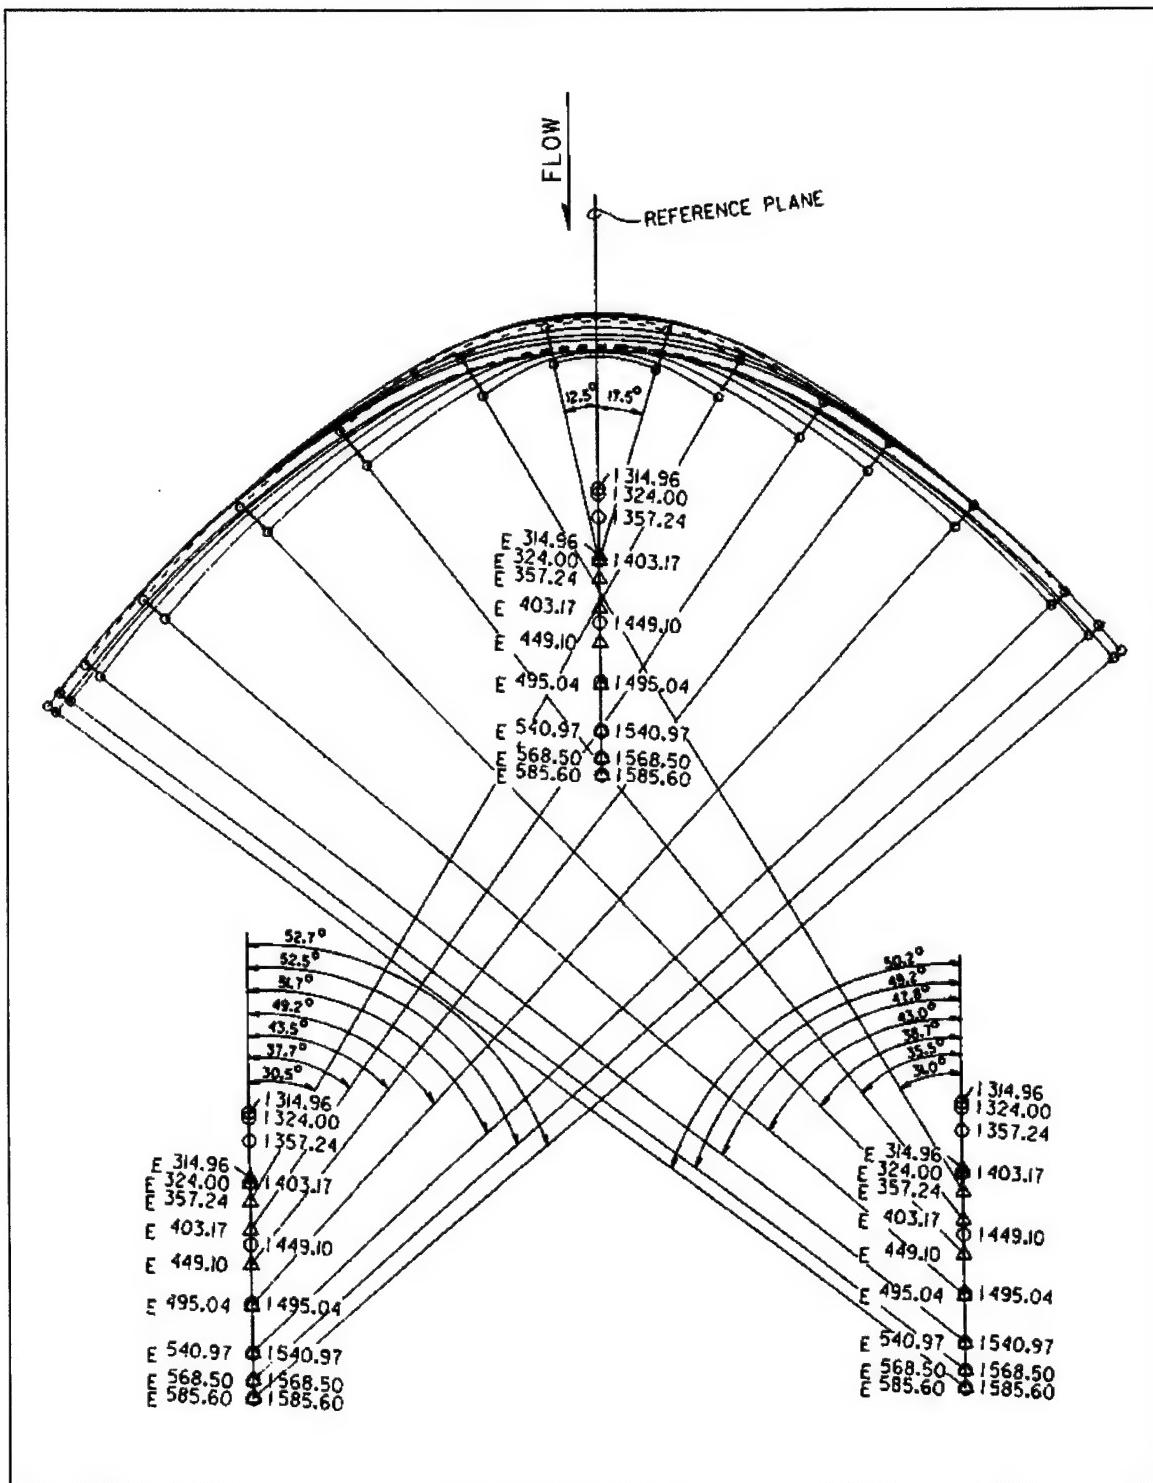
Plan of a three-centered variable-thickness arch dam
